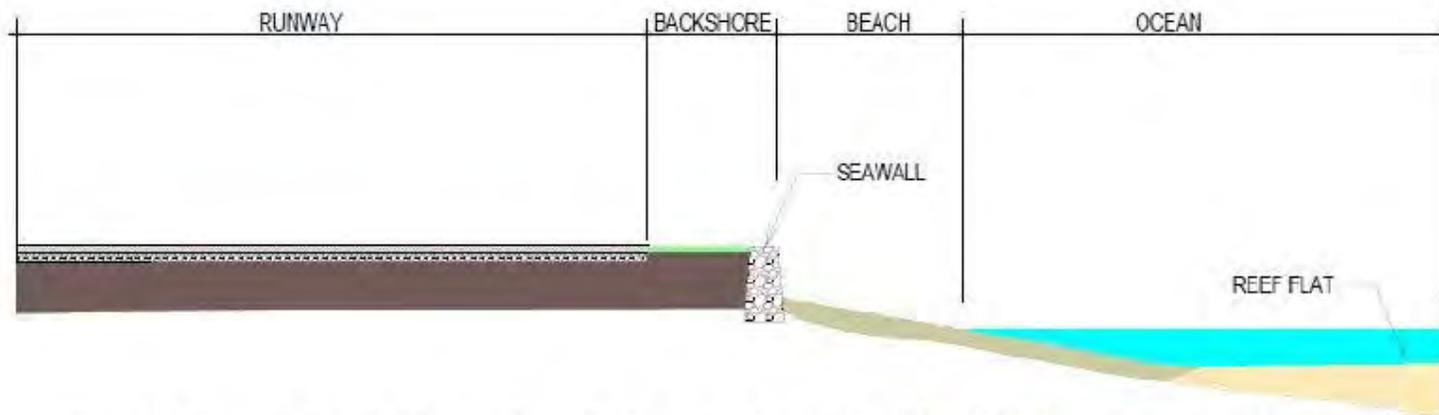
Concrete Rubble Masonry Seawall Alternative. Schematic of the CRM Seawall alternative design. Schematic provided by Corps.
